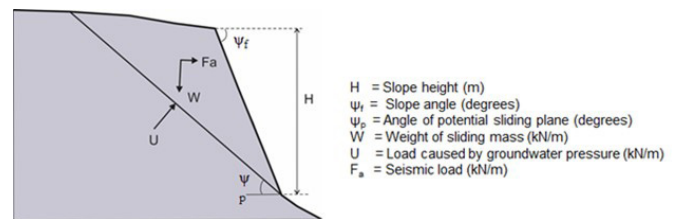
Typical geometry for potential plane failure (Panthi, 2022).
